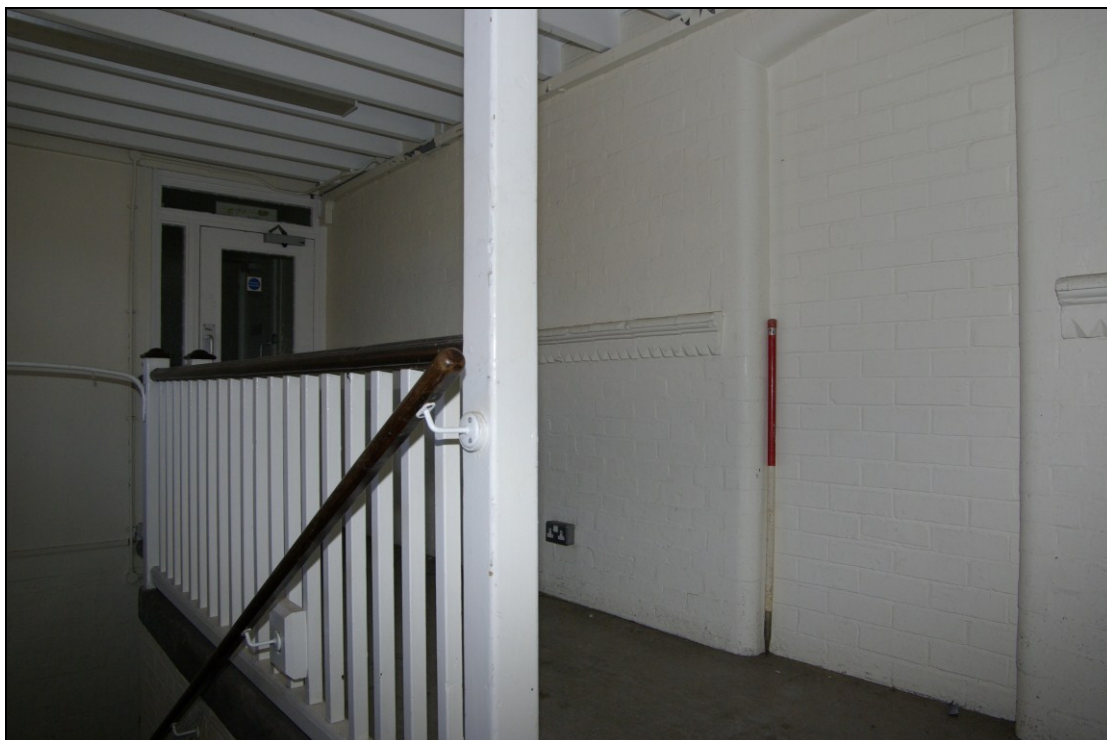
Moulded brickwork and nail head motif dado-rail and blocked doorway on first floor landing, leading into girls' school room. Looking south-east.
